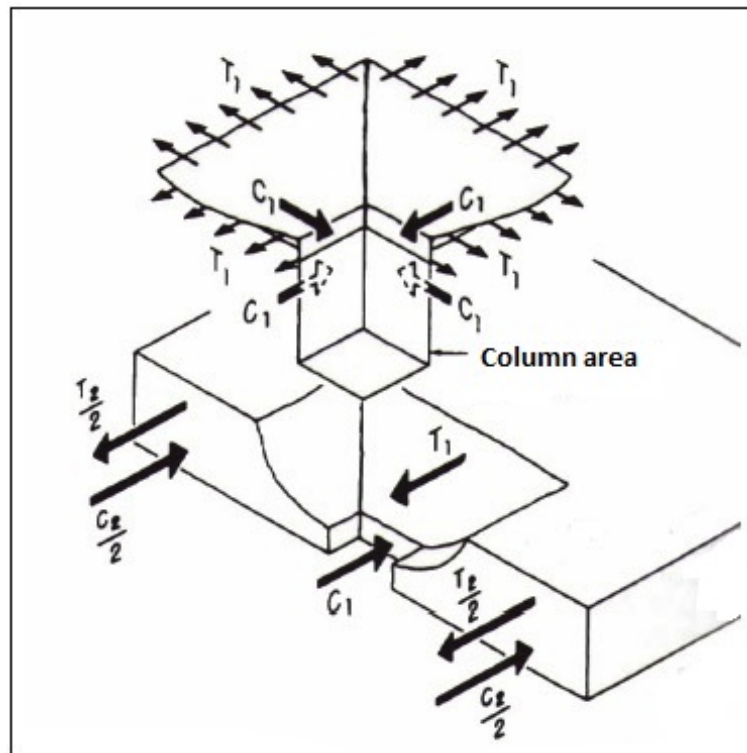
Horizontal forces acting on sections near critical diagonal tension cracks of a reinforced concrete slab-column connection
